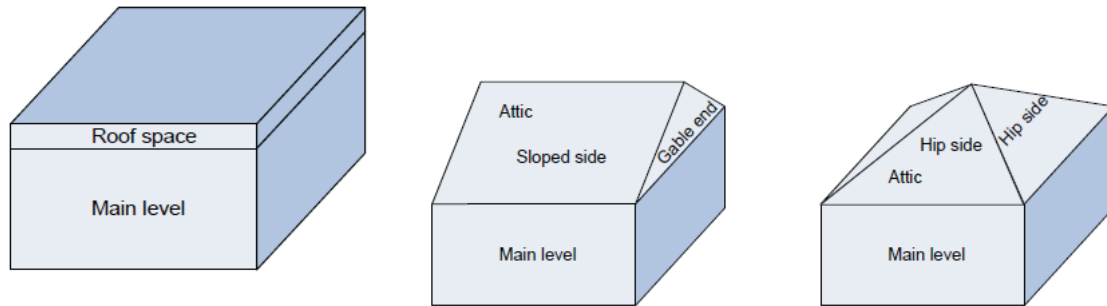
Roof space or attic configurations (a) flat roof space, (b) gable type attic, (c) hip type attic (Swan, 2010)
